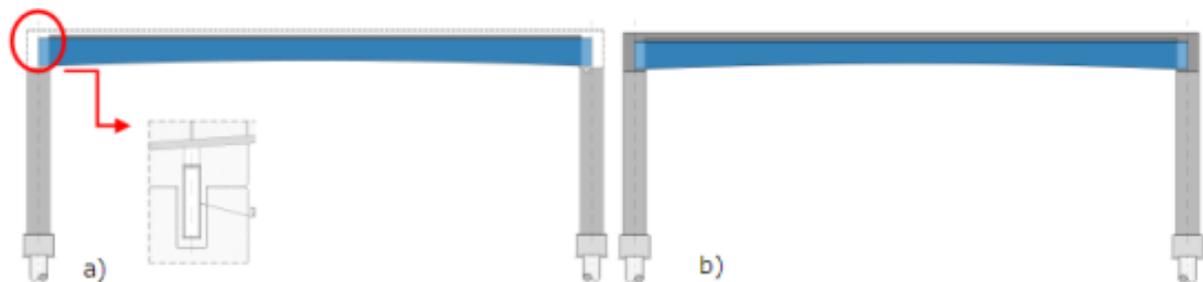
Construction stages: a) Simple supported girder; b) Frame effect
